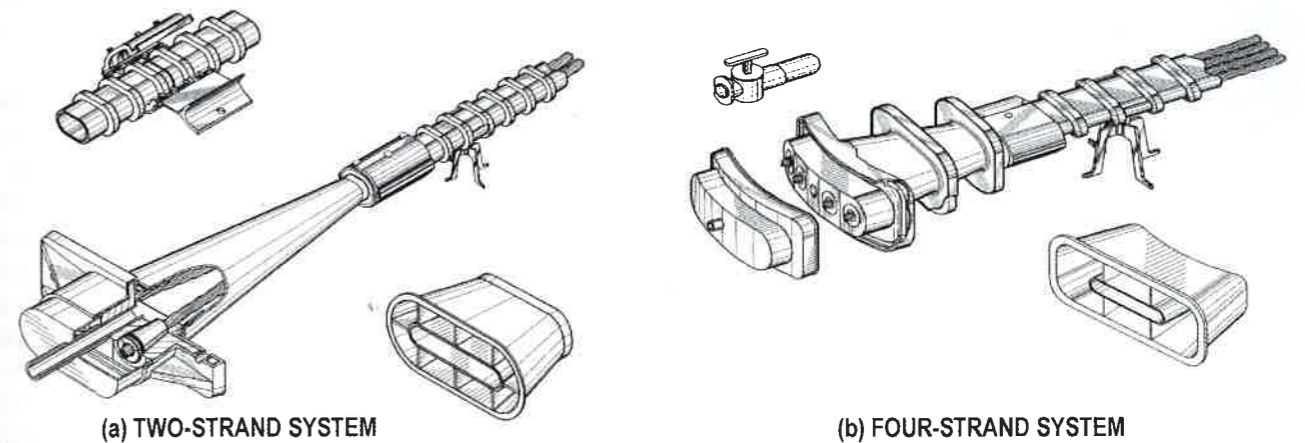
B-3 and 4 show examples of typical anchorage devices for bonded tendons used in slabs.
